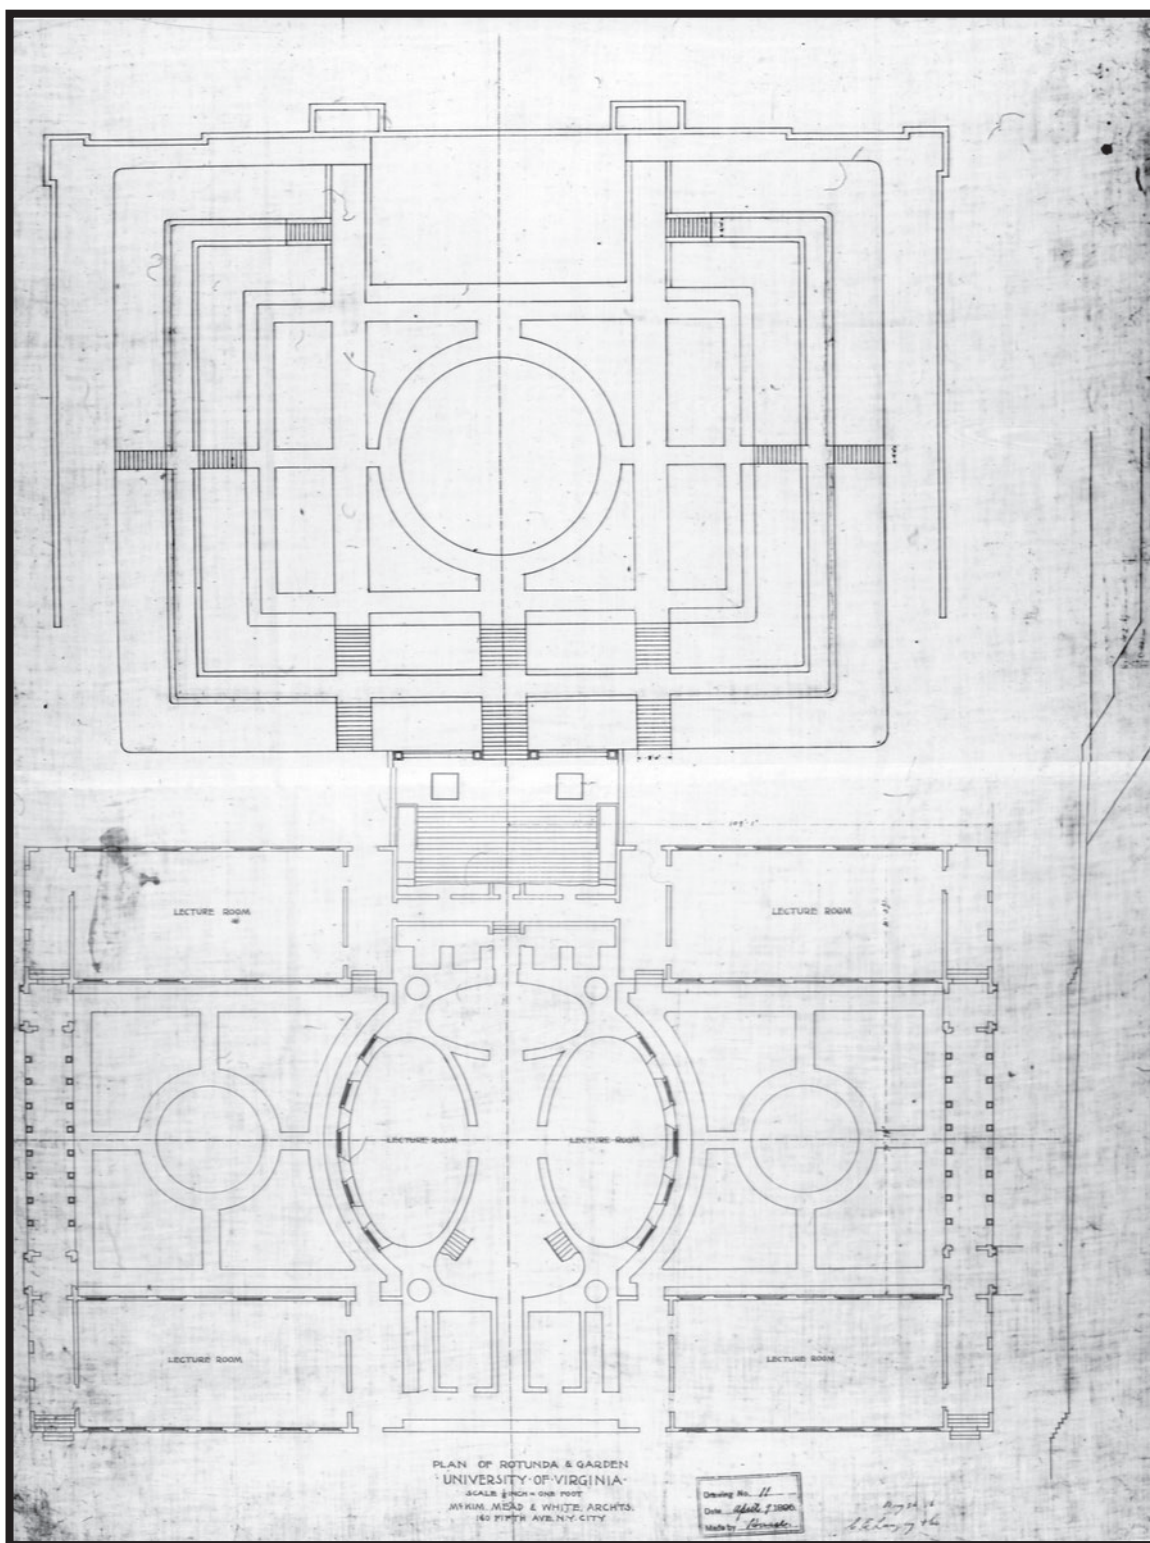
McKim, Mead and White, site plan for the Rotunda, showing proposed north terrace and east and west courtyards, April 9, 1896.
